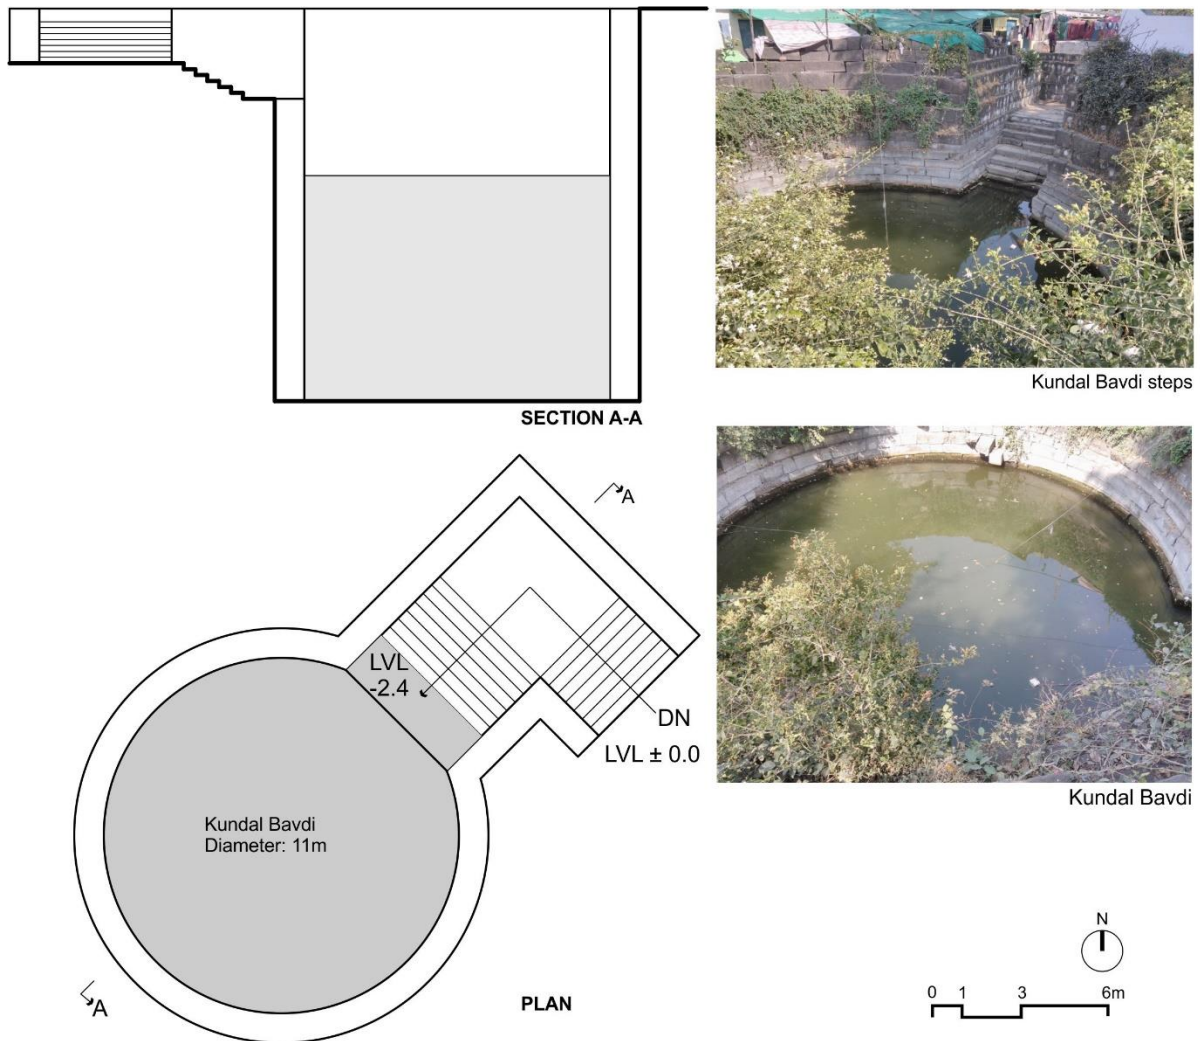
Plan, section and photograph of Kundal Bavdi, Junnar.
